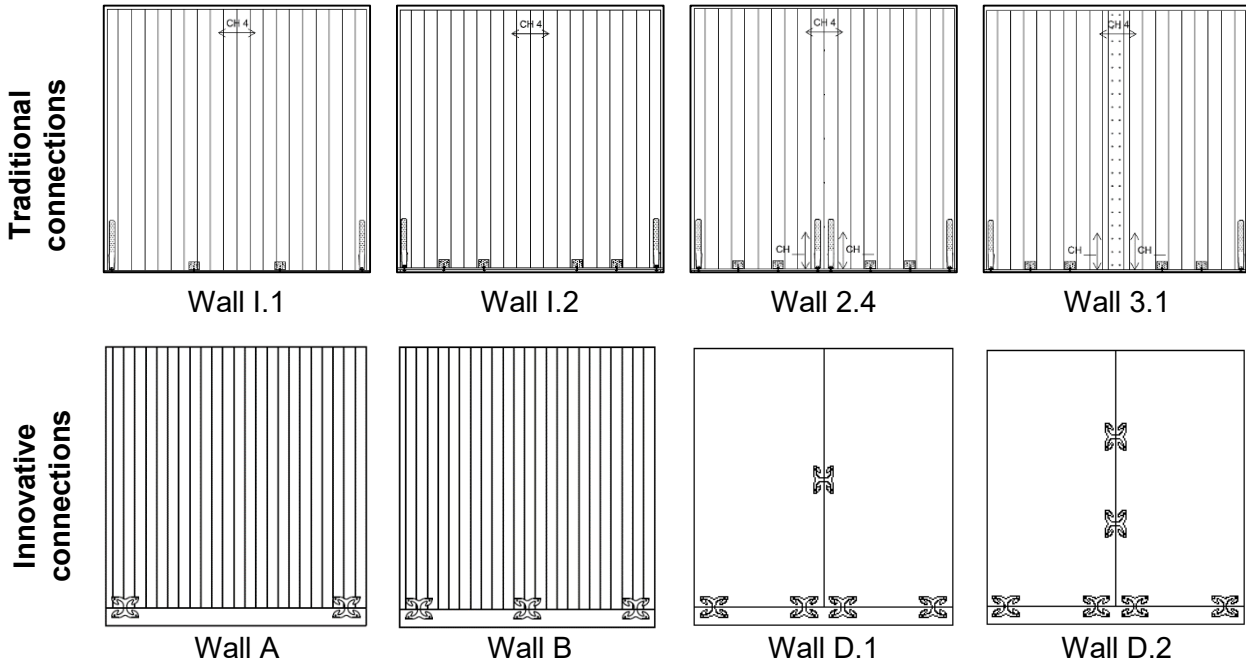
Geometry and connection arrangement of the investigated walls: tested walls with traditional connections (first row); simulated walls with innovative connections (second row).
